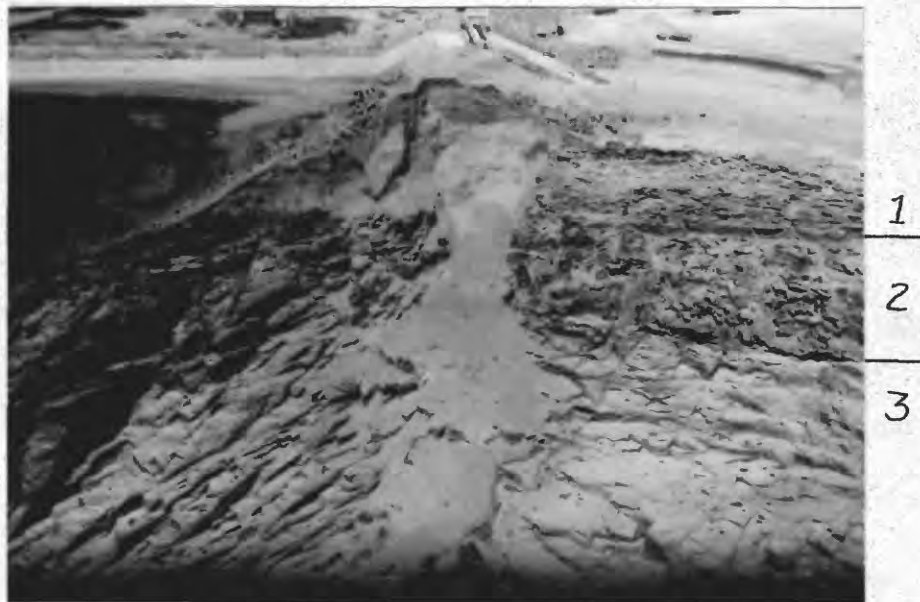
Aerial view of right abutment, Teton Dam, nearly perpendicular to the canyon wall. Note abrupt termination of unit 2 just downstream from the embankment remnant. Thickness of unit 2 is about 61 feet. View to northwest taken June 1976.
